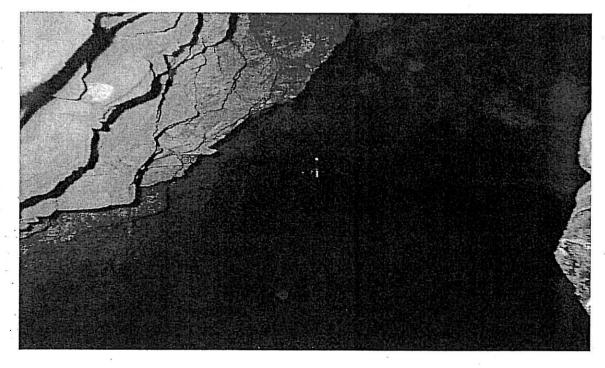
Inspecting Gorge Pumping Station Approach Tunnel
